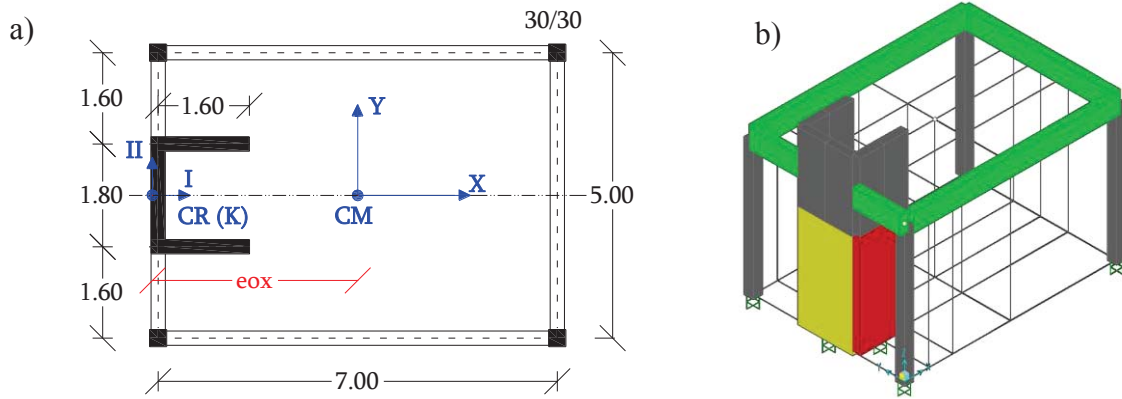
Single-story symmetric building: a) plan view; b) finite element model.
